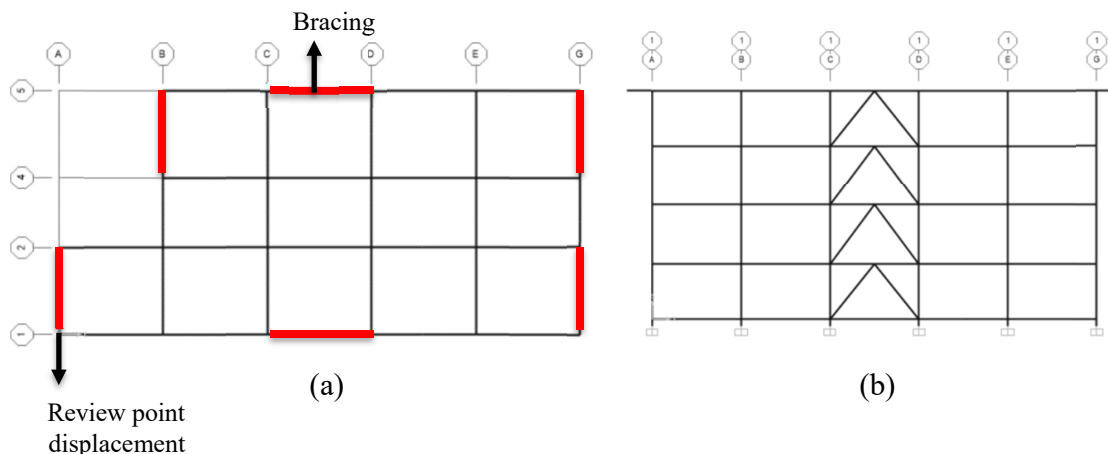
Views and Building Plan On Concentrically Braced Frames System (CBF)
